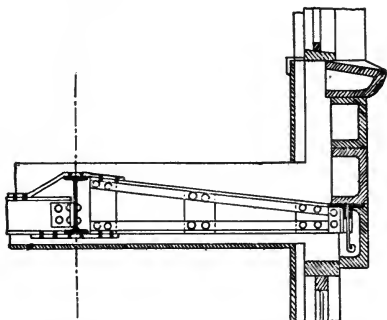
Spandrel Section through Bay Window Masonic Temple, Chicago.
